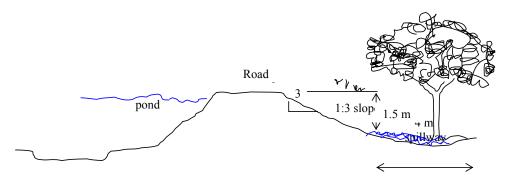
Cross-section of discharge creek's spillway (not to scale) (Source Figure 2, Environmental Management Plan. Appendix 3)
